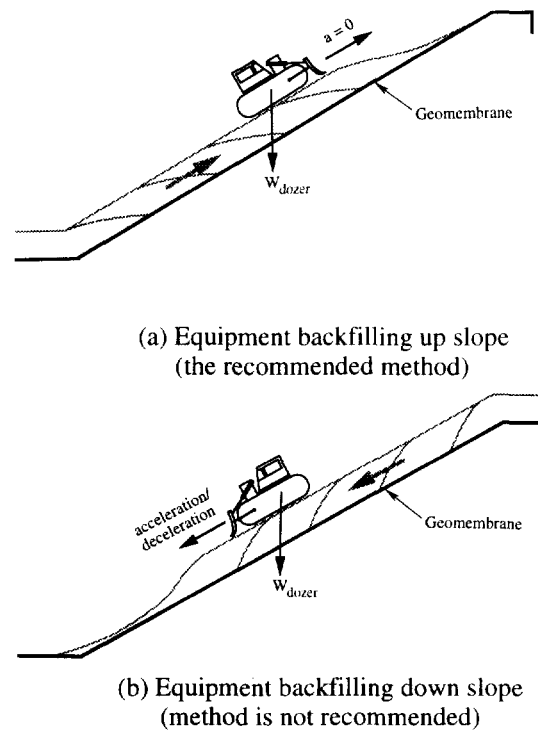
Construction equipment placing cover soil on slopes containing geosynthetics.
